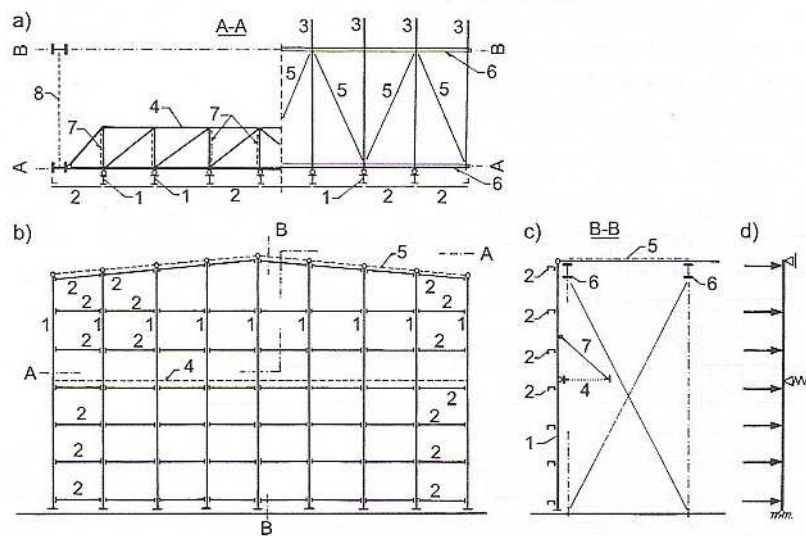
Construction of high endwall: 1- secondary column, 2- endwall girt, 3- purlin, 4- wind bracing, 5- roof bracing, 6- roof rafter, 7- suspension rod, 8- sidewall bracing
